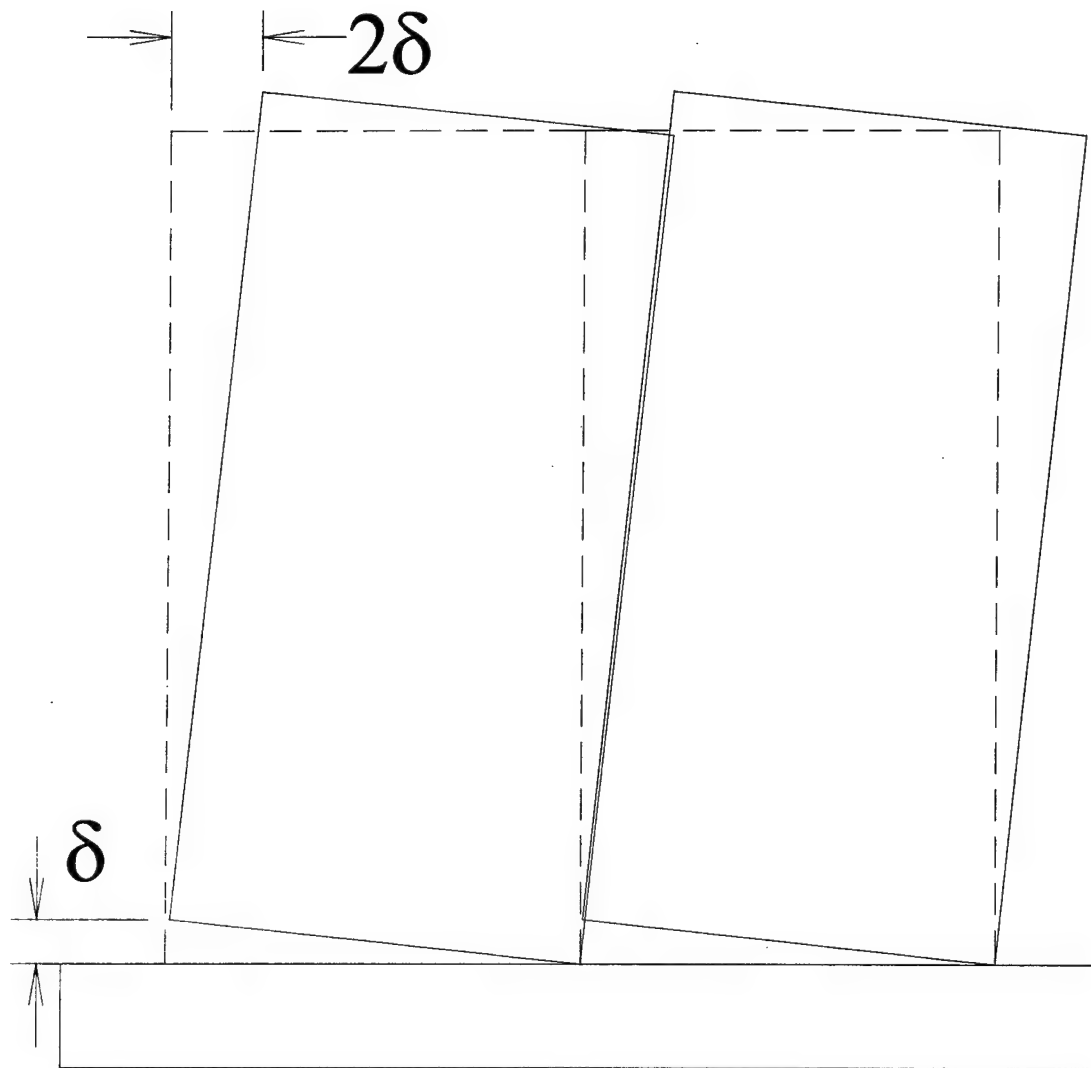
Actual Overturning Deflection in Shear Wall Testing Program
